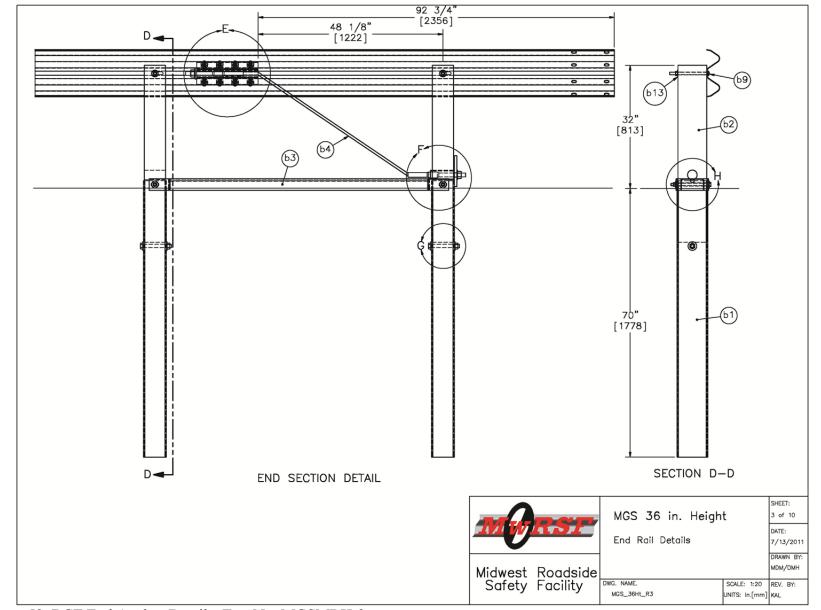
BCT End Anchor Details, Test No. MGSMRH-2
